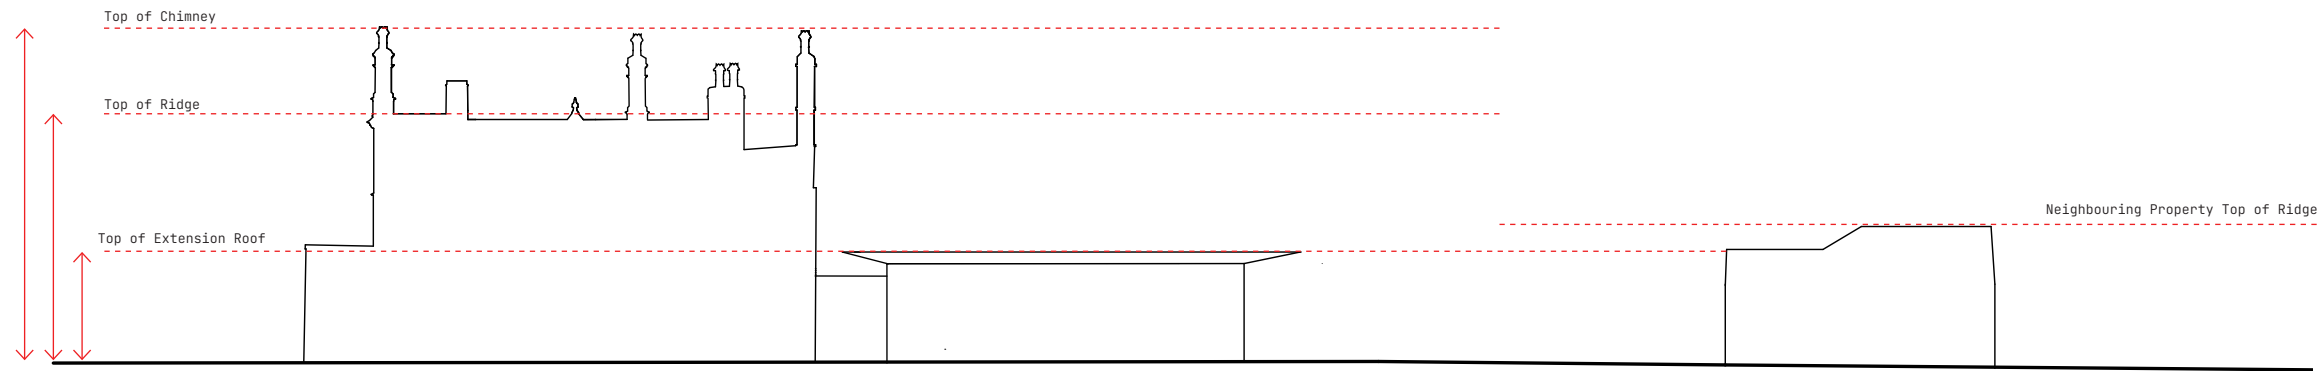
Principle Elevation Showing Proposed Outline clearly highlights the proposed extension is subordinate to the main dwelling and is of the same height/scale as the neighbouring property
